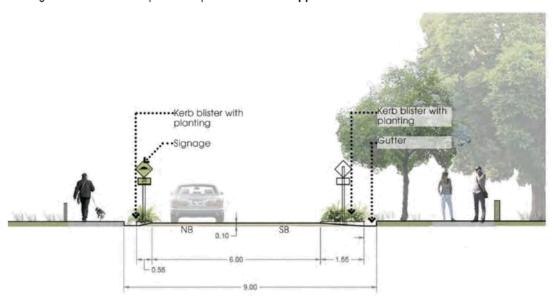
Entry Threshold with Landscaped Blisters – Short Section
